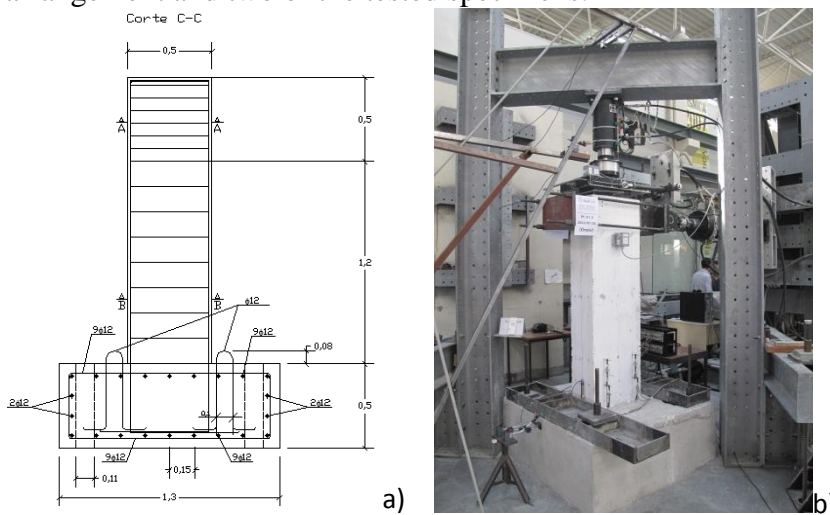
a) Reinforcement detailing; c) Column PC_01_N02
